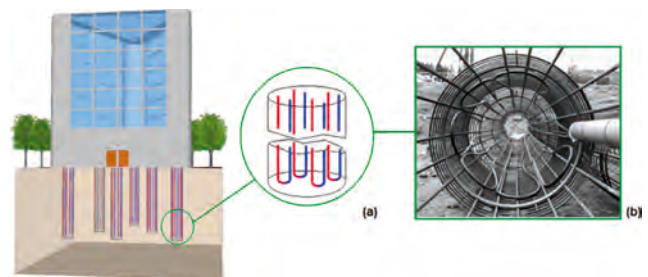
Column used in energy facilities: a) pipe-positioning scheme in a column: b) geothermal pipes attached to a column reinforcement [14]
